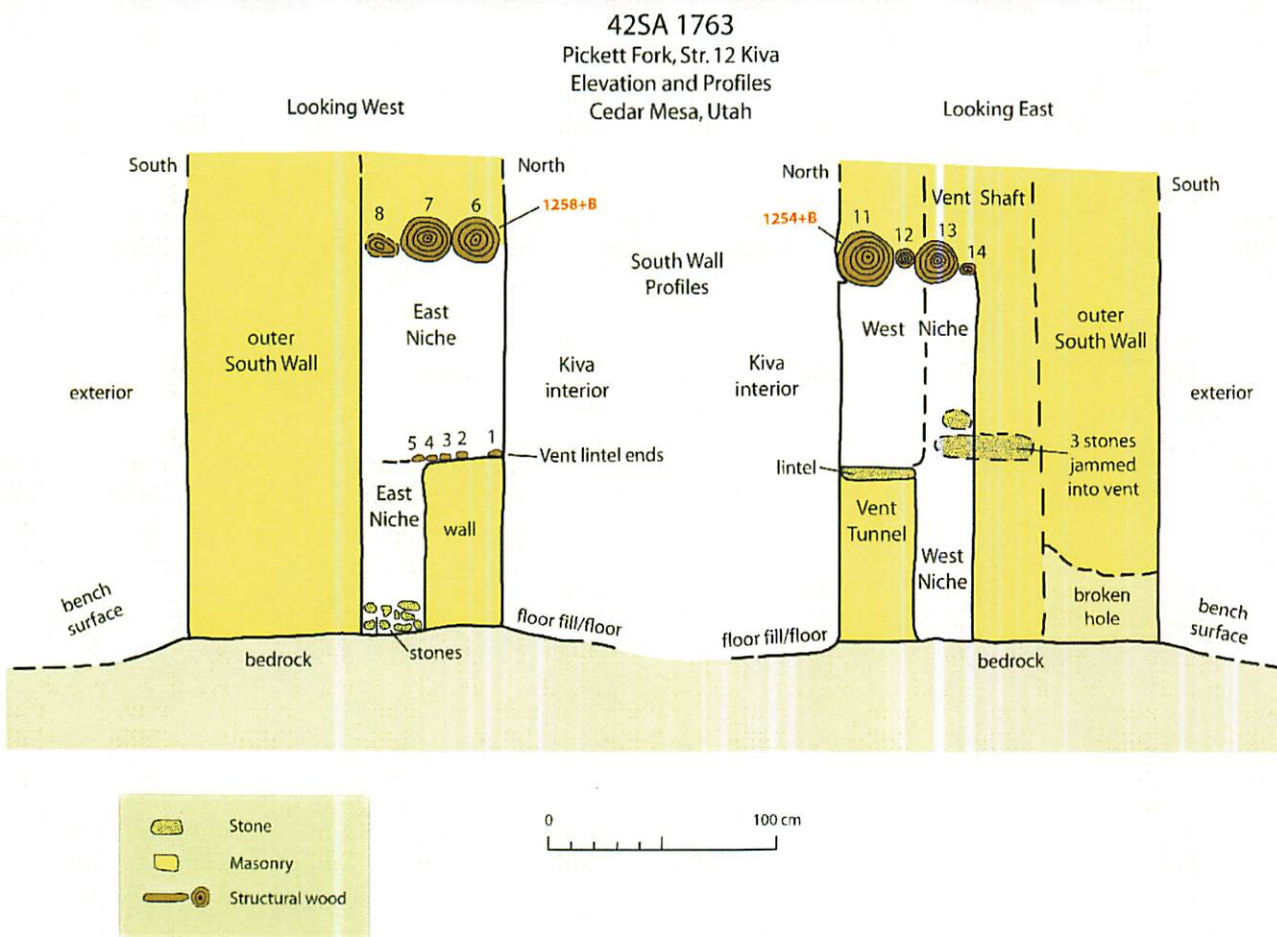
42SA 1763, Pickett Fork, Structure 12 (kiva). Showing the wall elevation for the interior South Wall. Note the range of cutting dates that indicate stockpiling elements before construction commenced at about AD 1260-1263.
